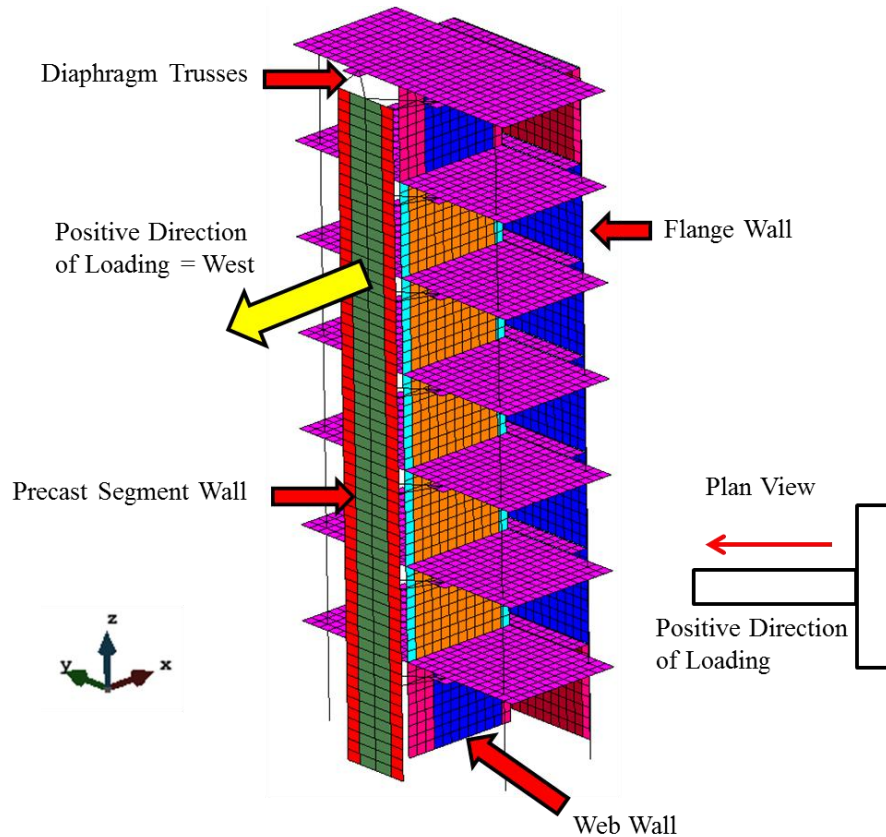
Finite Element Model of Seven-story Reinforced Concrete Wall-Slab Building Slice
